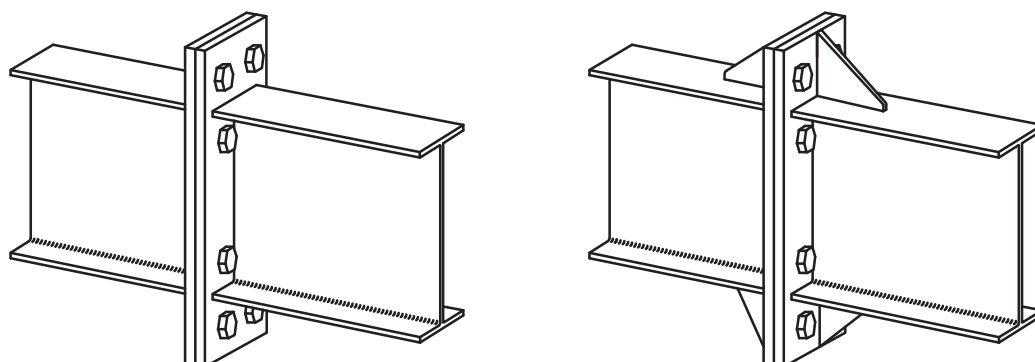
BOLTED MOMENT END PLATE BEAM SPLICE CONNECTION
